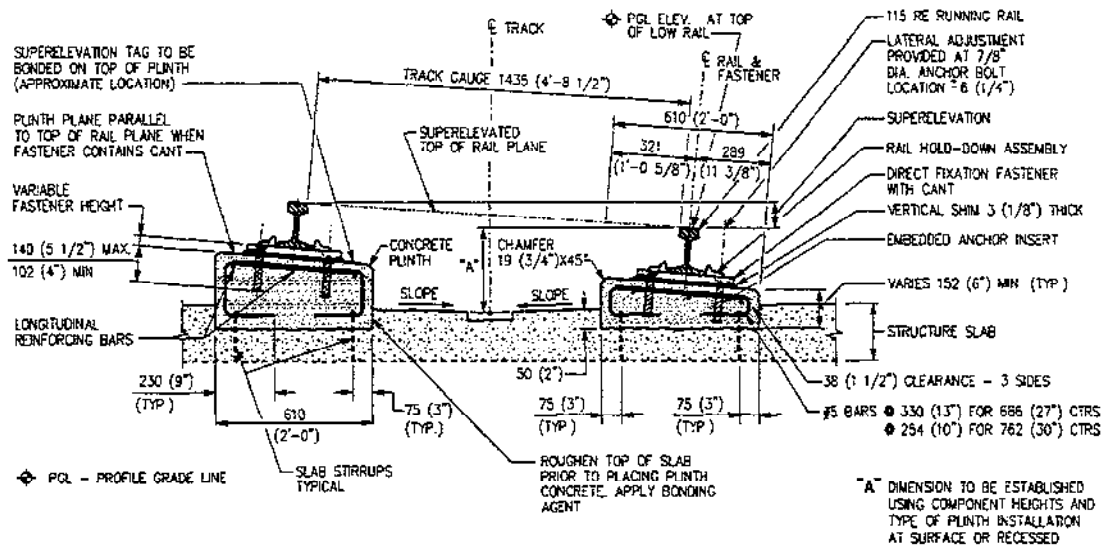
Concrete Plinth Design—Curved Superelevated Direct Fixation Track
